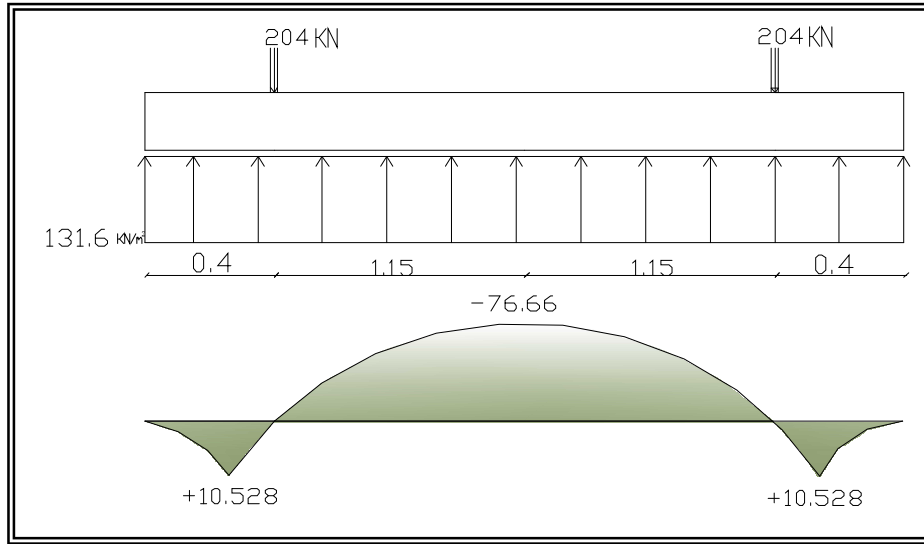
Shear envelope of mat footing under stair Section B-B
